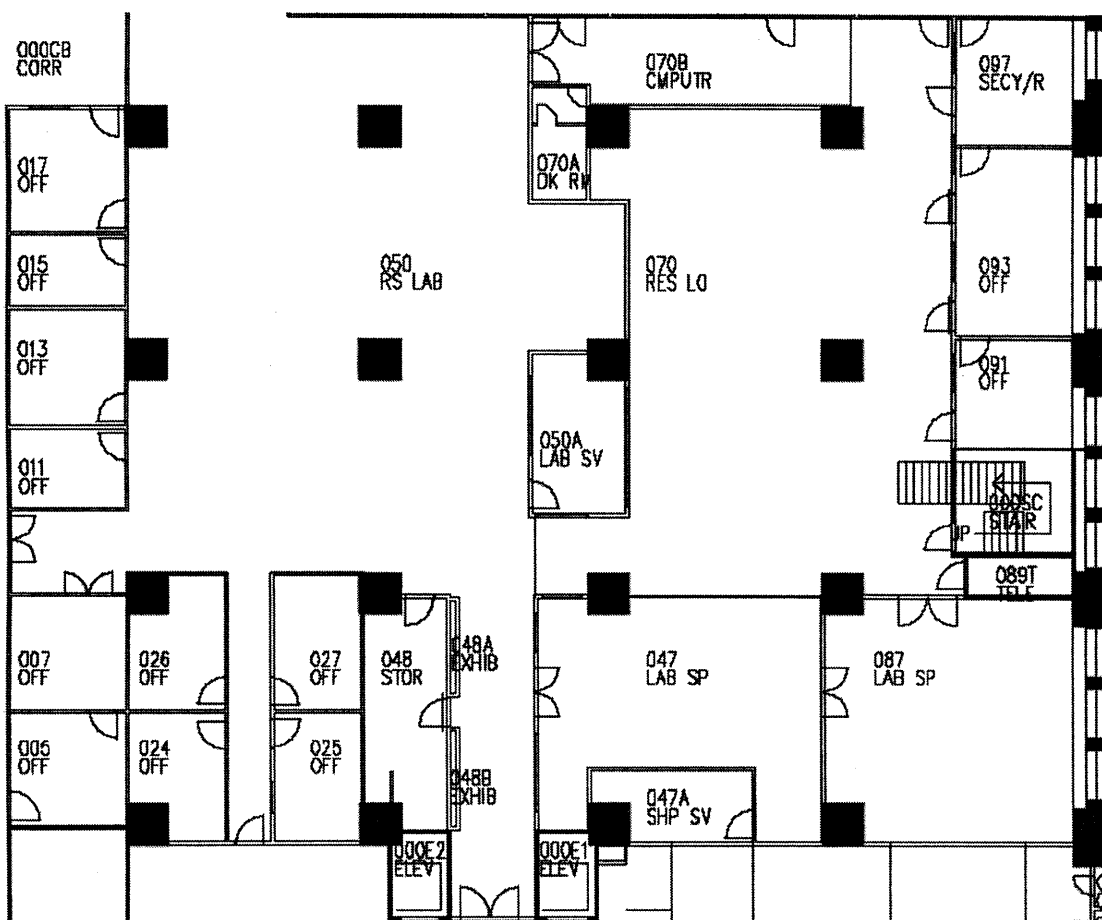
Main lab floor plan showing monitored zones in lower right. Room 047 is the shop and room 087 is the prototyping lab. Columns are 46"x 46" concrete.
